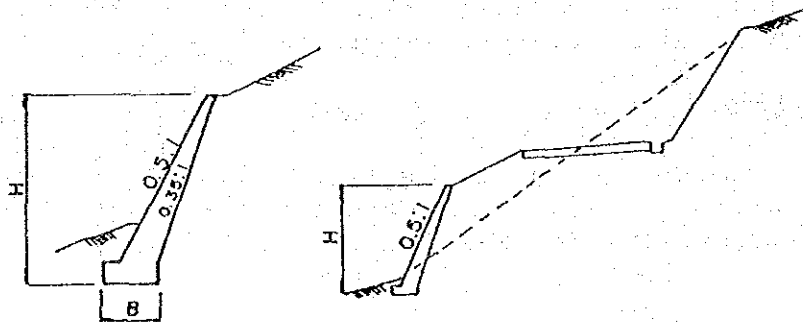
SUPPORTED TYPE CONCRETE WALL
